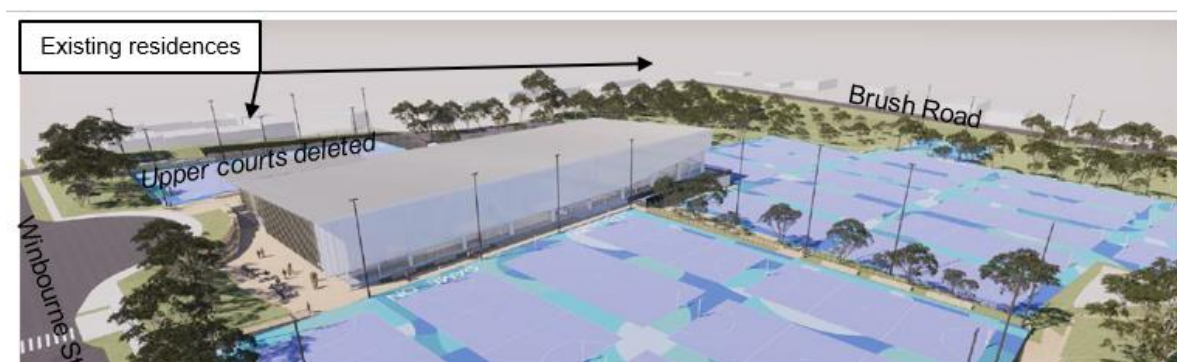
Extract from the Schematic Landscape Design plans showing an oblique aerial view taken from the south-west corner of the site looking across the site (showing an indicative photomontage of the building, courts and landscaping).
